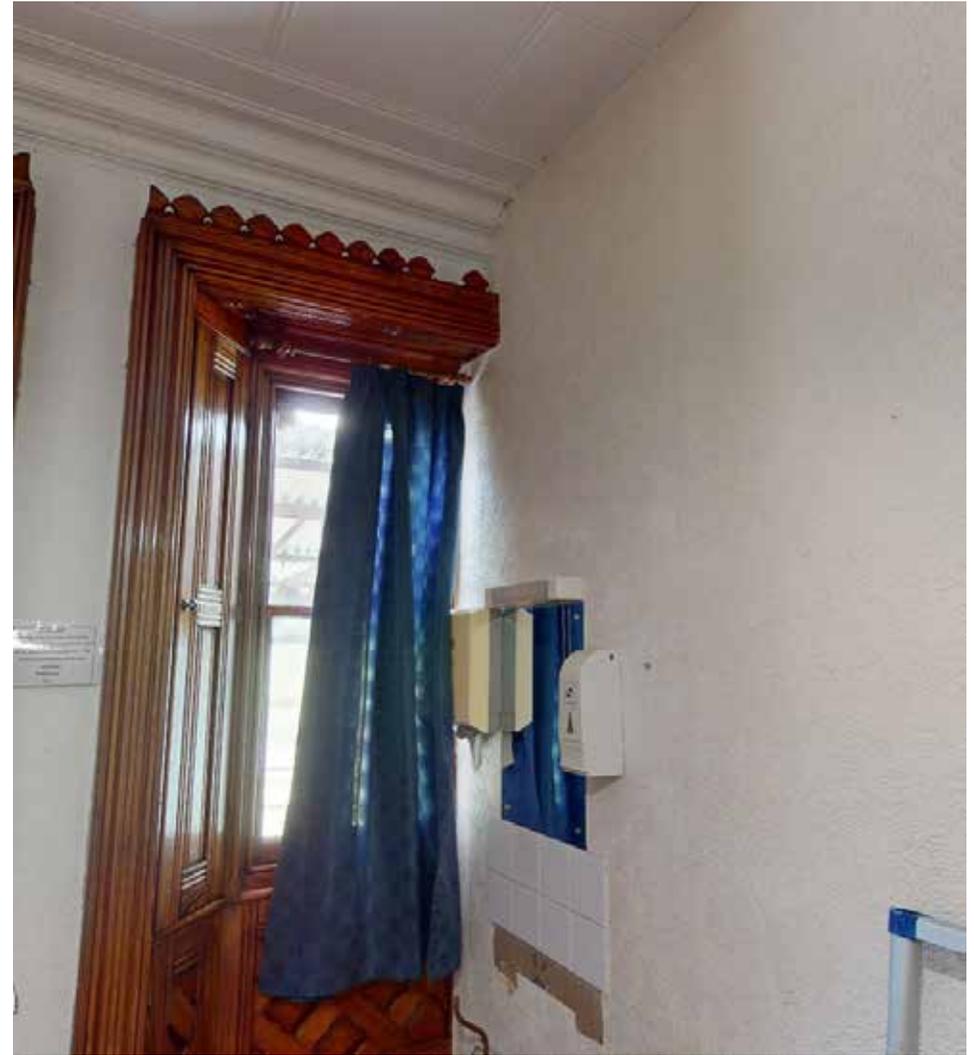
Photo of the first floor showing modern partition wall to be removed as part of works. Image to support heritage matrix proposed works 04
